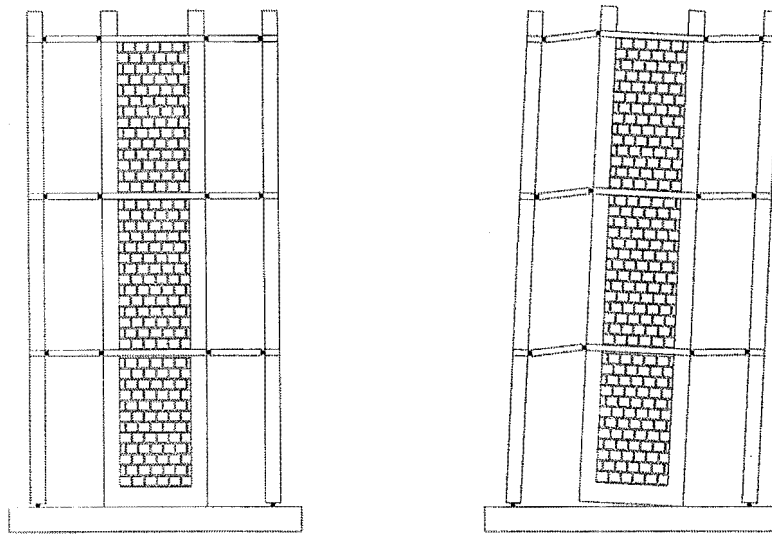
Drawing of specimen showing intended built-in hinges in exterior columns and slabs
